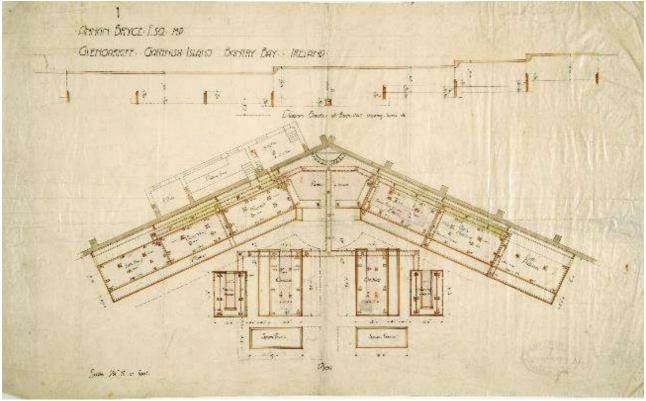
Harold Peto plan, Walled Kitchen Garden growing houses.
